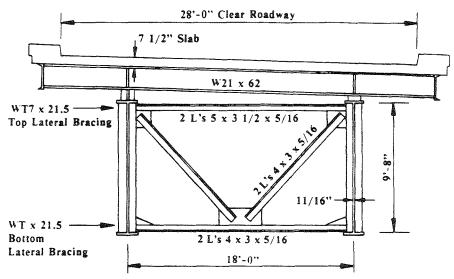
Cross section of 138-ft simple span, noncomposite two-girder bridge (Ref. 54).
